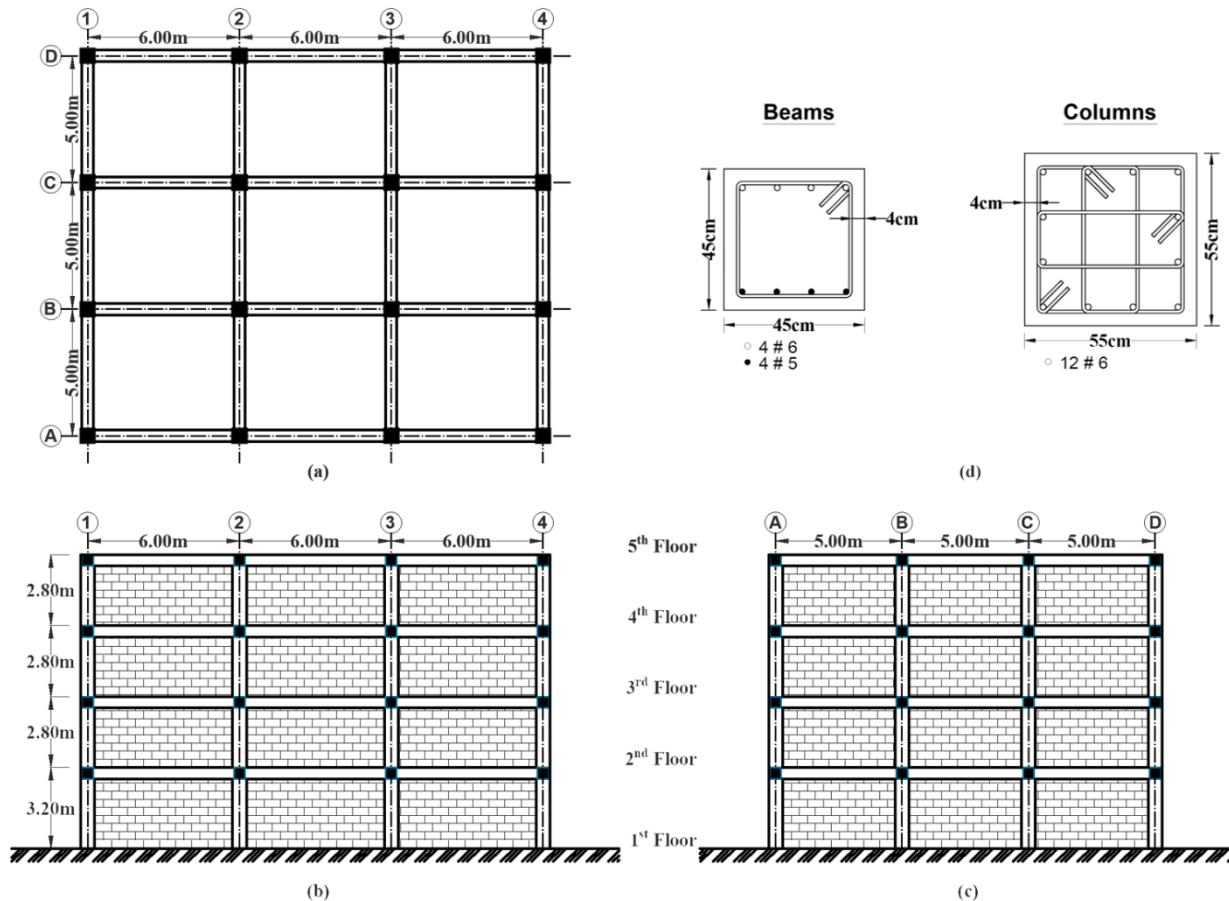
(a) Structural plan view. (b) Elevation view of one longitudinal perimeter frame. (c) Elevation view of one transverse perimeter frame (d) Beams and columns reinforcement detailing.
